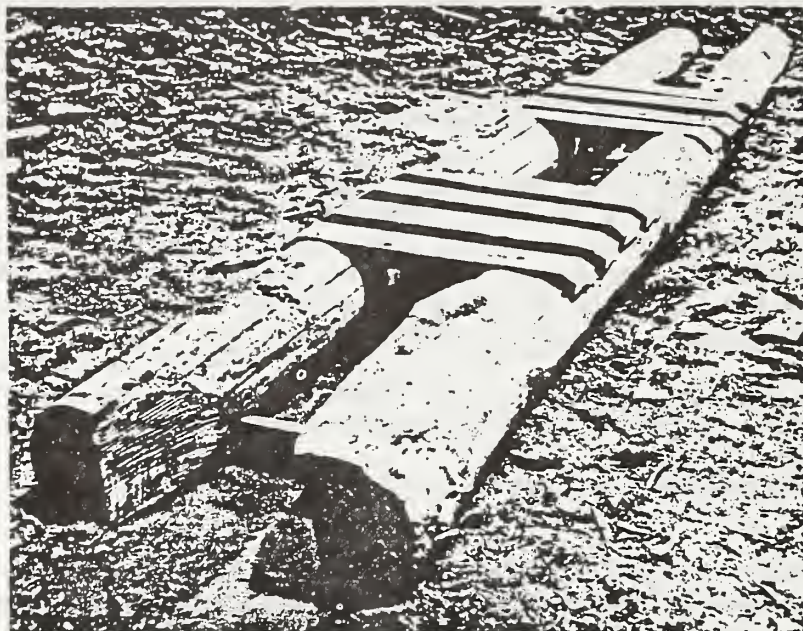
An open-top culvert constructed of wood. Spreaders on the bottom of the log maintain culvert shape and the 5-cm spaces between the boards prevent water from running down wheel tracks and across the culvert.
